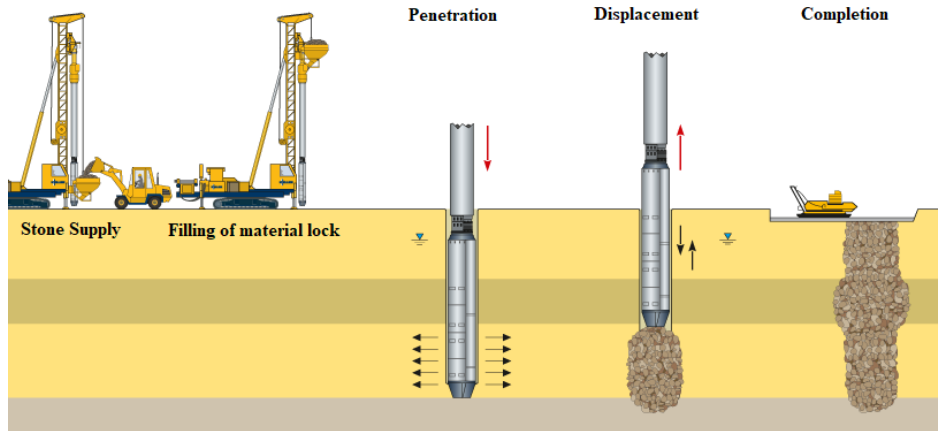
Dry bottom feed vibro replacement method (source: Keller group)
